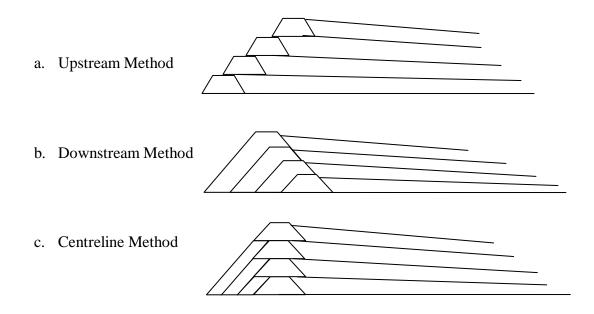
Three Basic Methods to Construct a Raised-Embankment Tailings Storage Facility.
